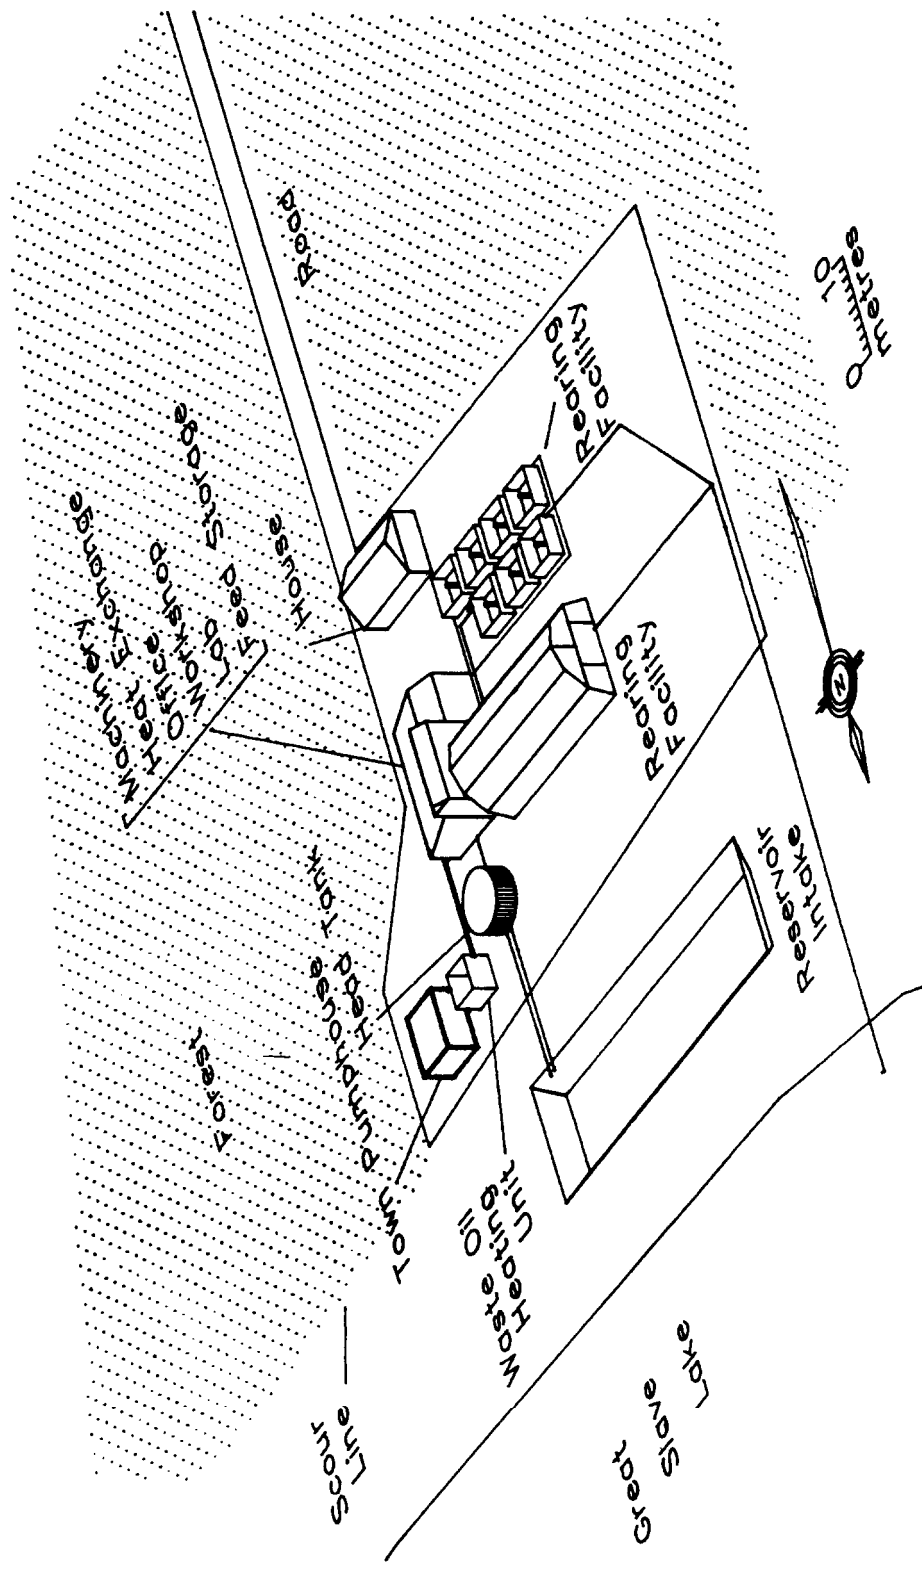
Conceptual Layout of Arctic Char Fingerling Production Facility – Plan View.
